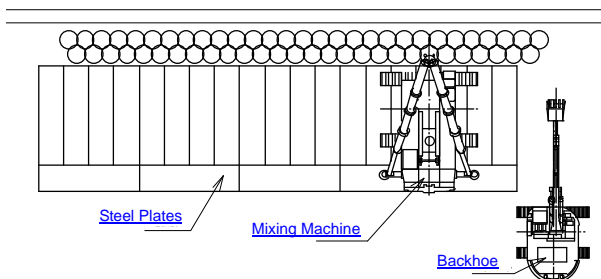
Site arrangement of mixing machine, backhoe and steel plates
